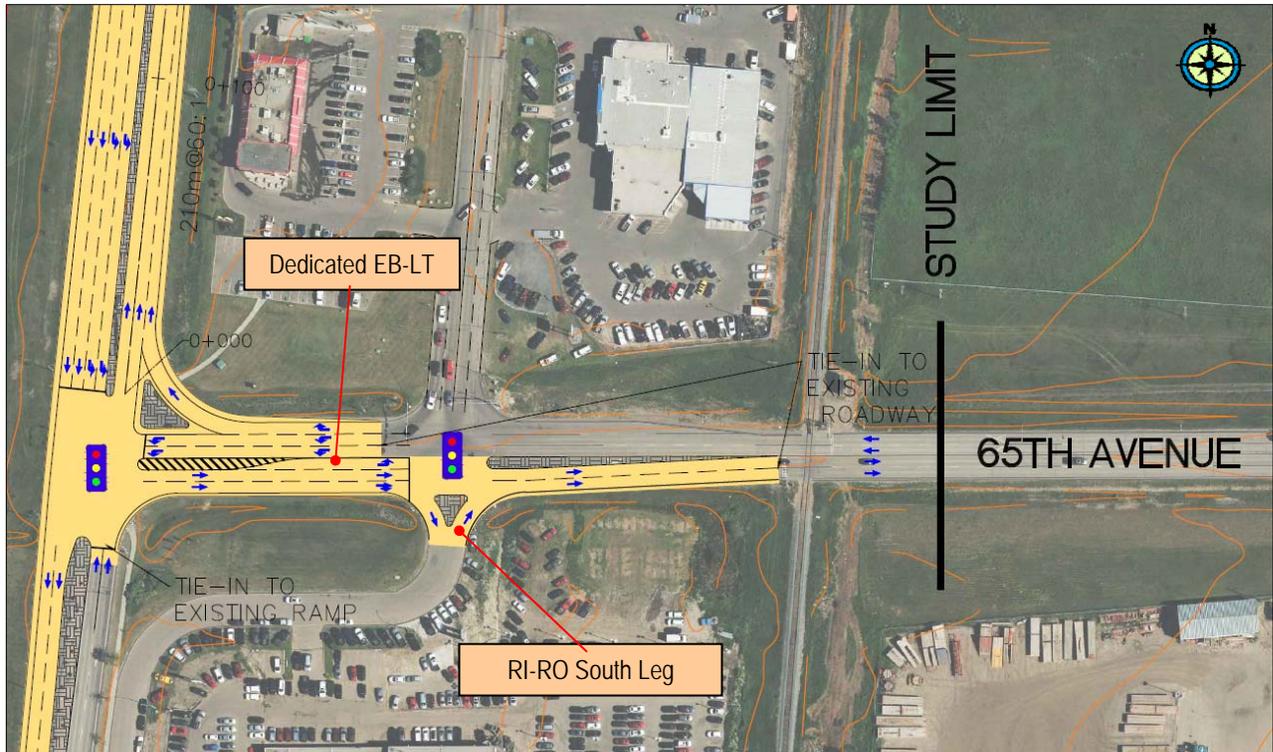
4: 65th Avenue East / Sparrow Drive Intersection
